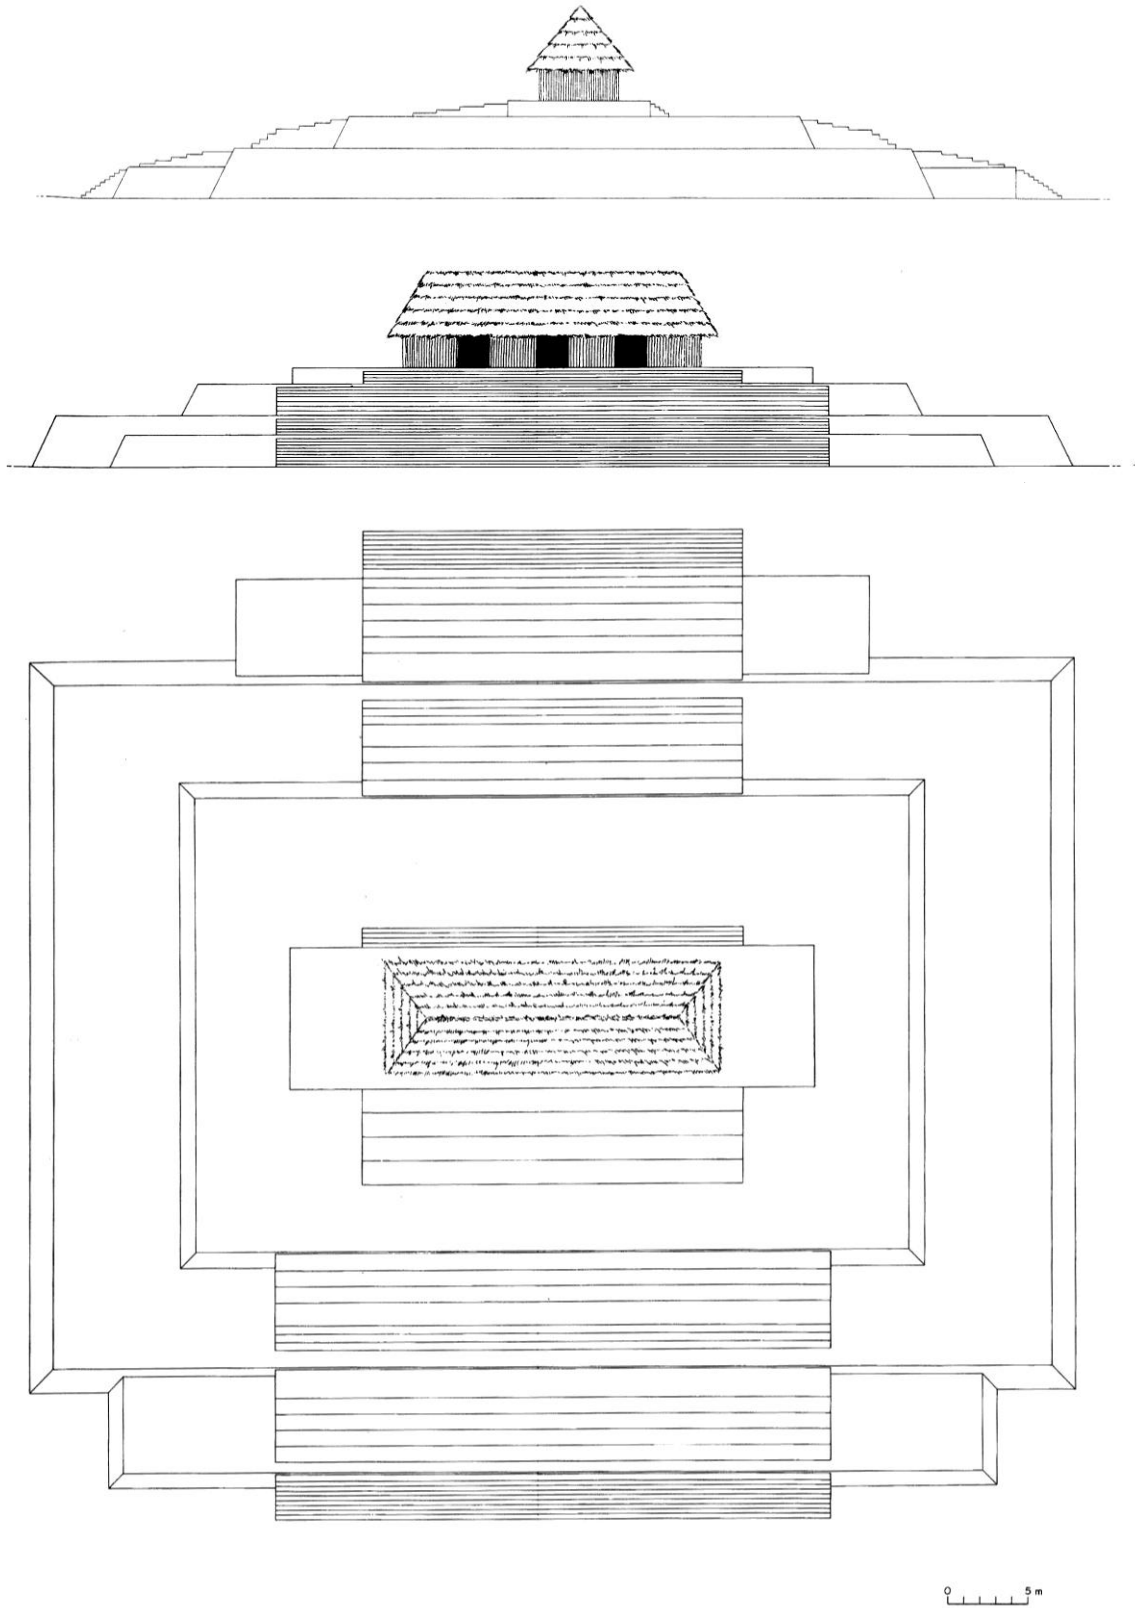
Reconstruction of north side (above), east façade (center) and plan view of Structure L7-27
